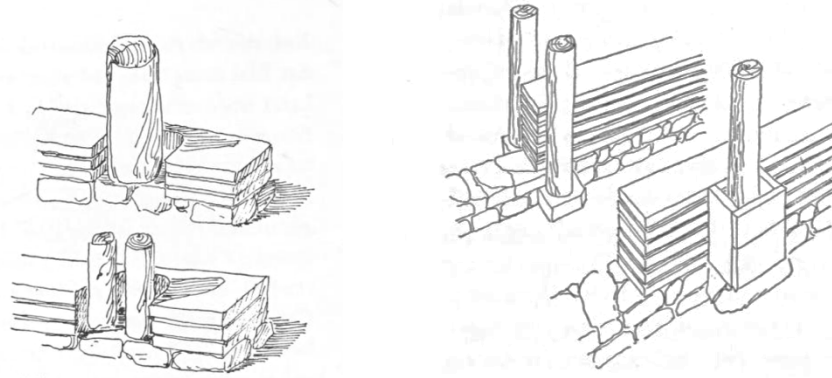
Kültepe/Kanesh, vertical timber supports or columns inside the mudbrick masonry (a; left) [20]; and freestanding on the sides of the wall (b; right) [21]. These elements' primary purpose must have been supporting the spanning roof beams.
